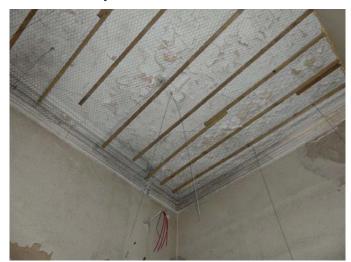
(left): The ceiling in Room F8 of the courthouse, viewed from the east
